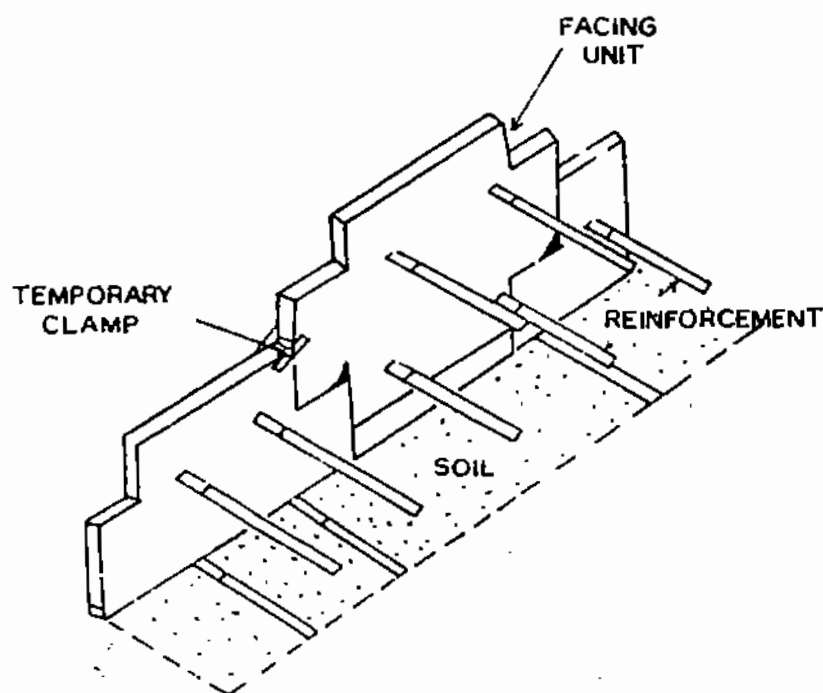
TELESCOPE METHOD OF CONSTRUCTION
